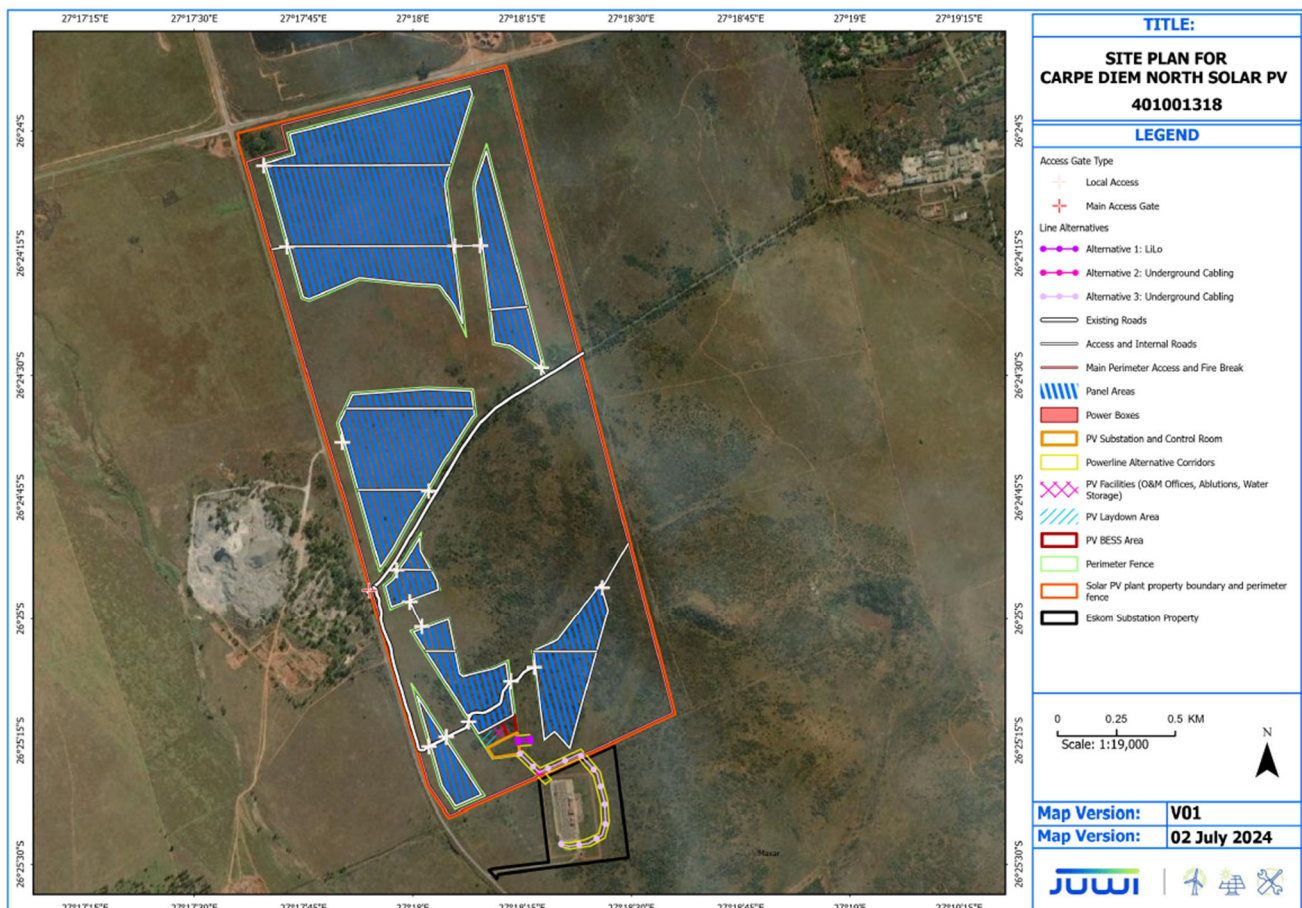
The proposed Site Development Plan for the Carpe Diem North Solar project.
